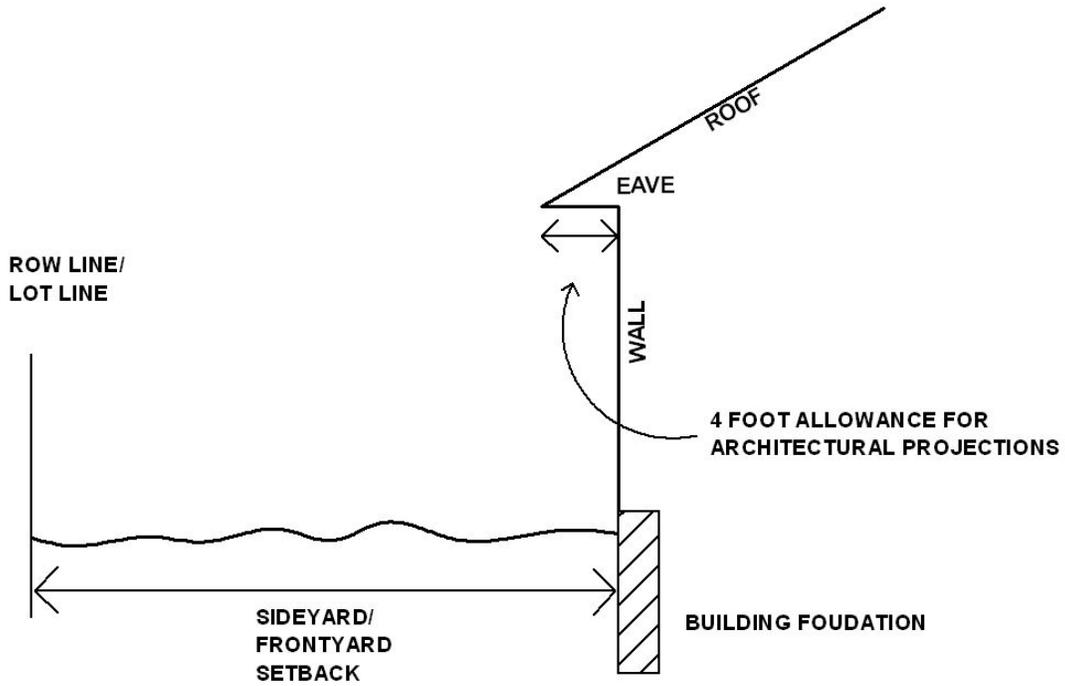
Building Setback Measurements Using Eave and Roof Overhangs
